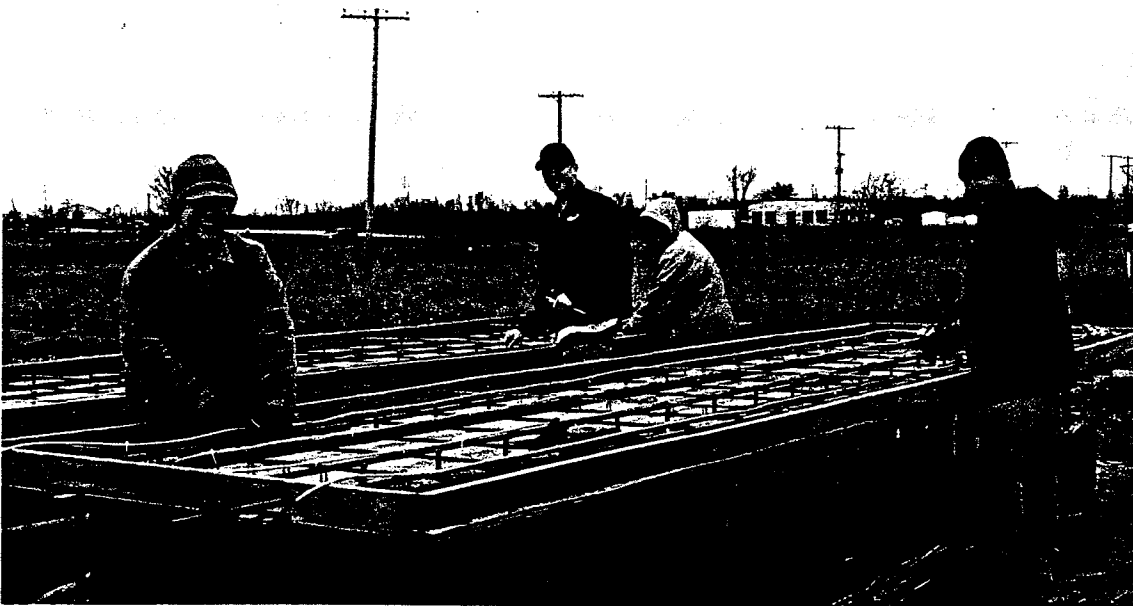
A photo showing ETDR cables which were looped four times through each deck and read as one long continuous cable.
